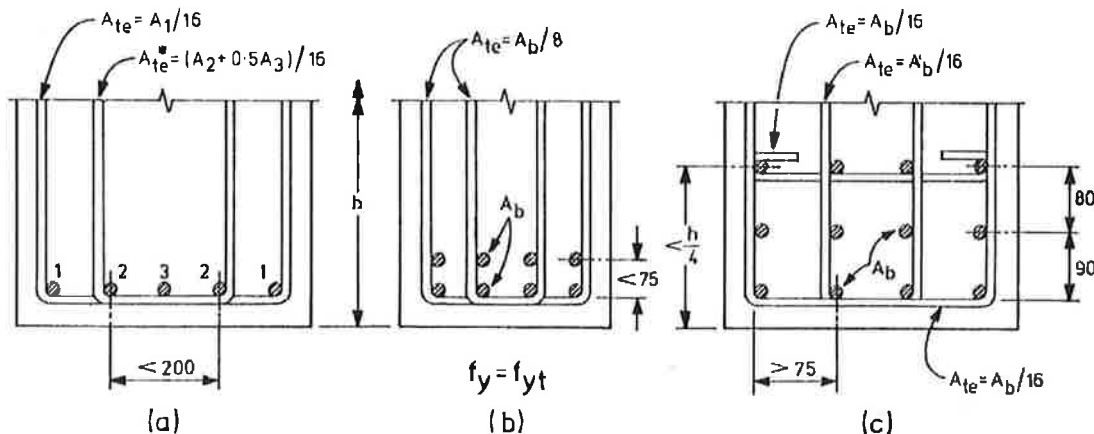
THE ARRANGEMENT AND SIZE OF STIRRUP TIES IN POTENTIAL PLASTIC HINGE ZONES
